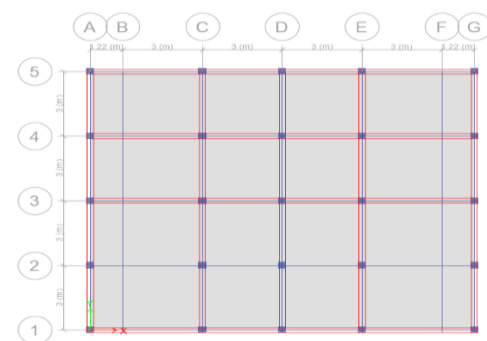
Soft Storey cum Floating Column (SSFC) Structure Plan for G + 5
